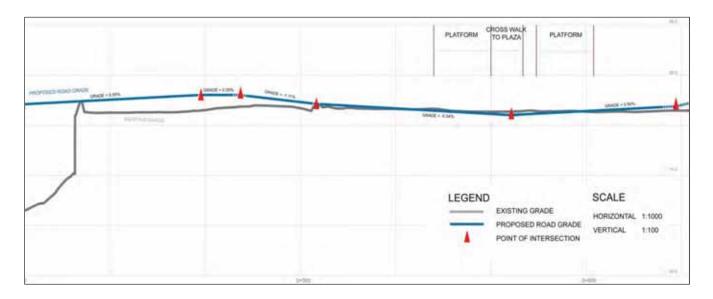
Villiers Street Road Vertical Profile Alternative 2
